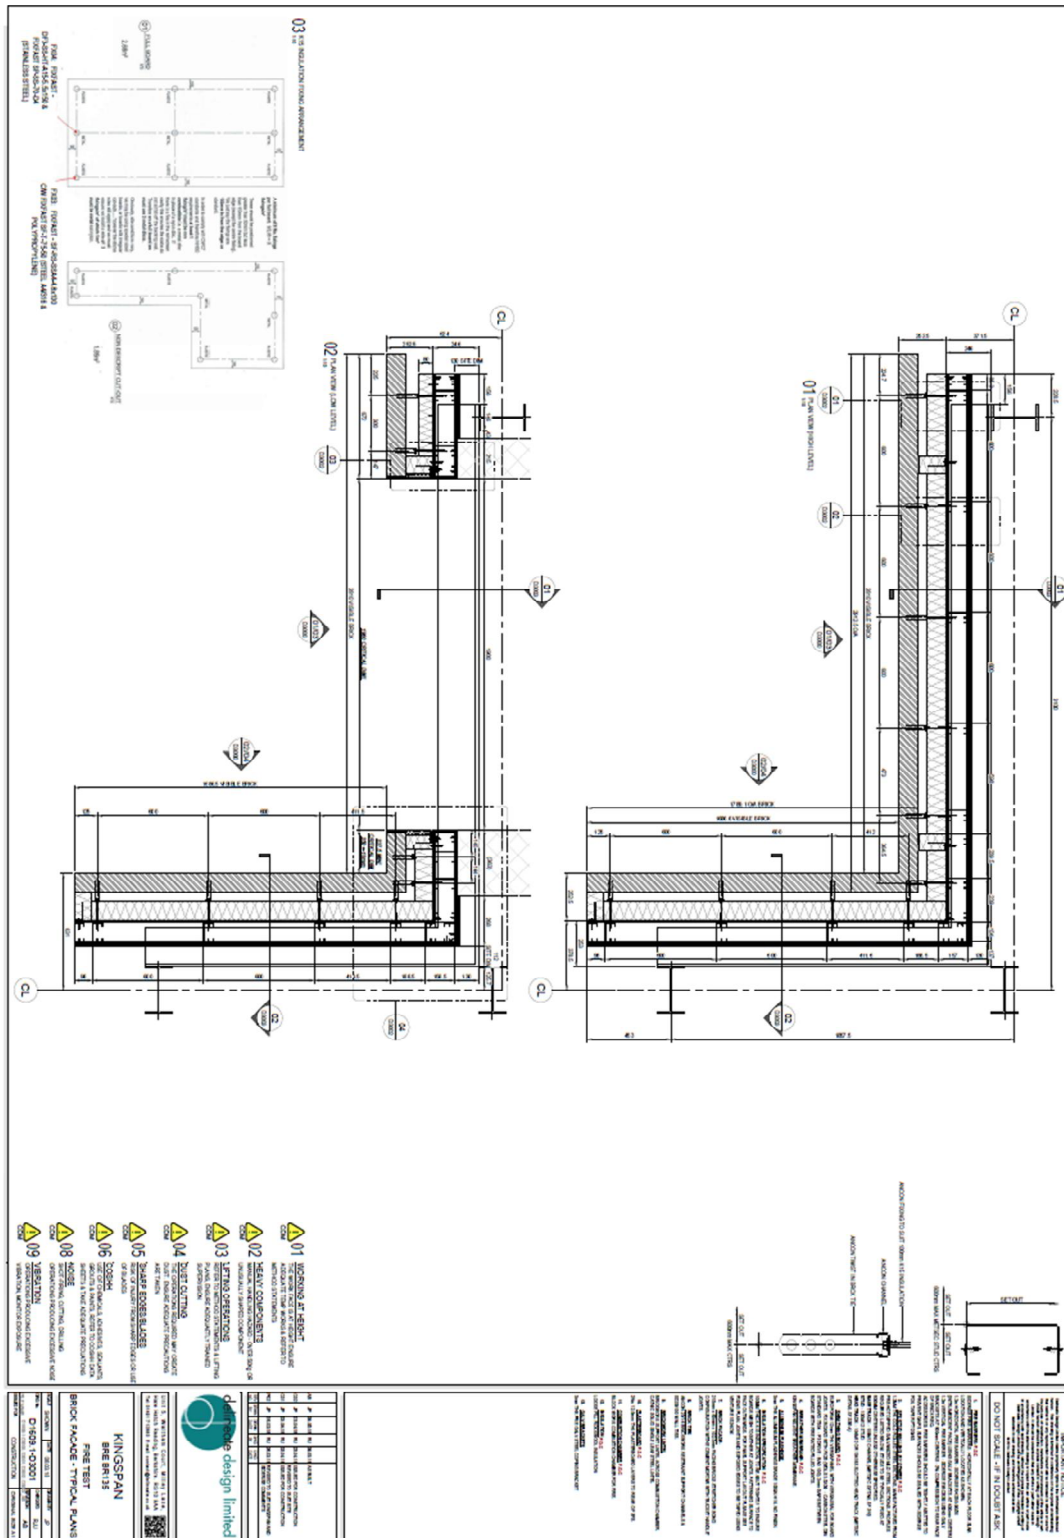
Plan view cross sections (supplied by Test Sponsor).
